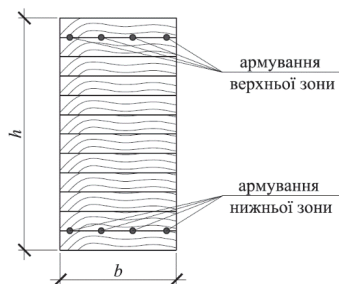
Cross section of the arrow arch of glued wood, reinforced with composite reinforcement
